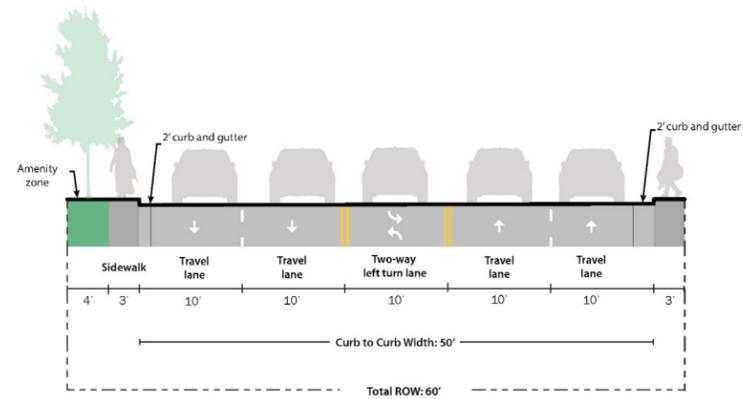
Section F (72nd Avenue West of Raleigh Street – Looking East)
